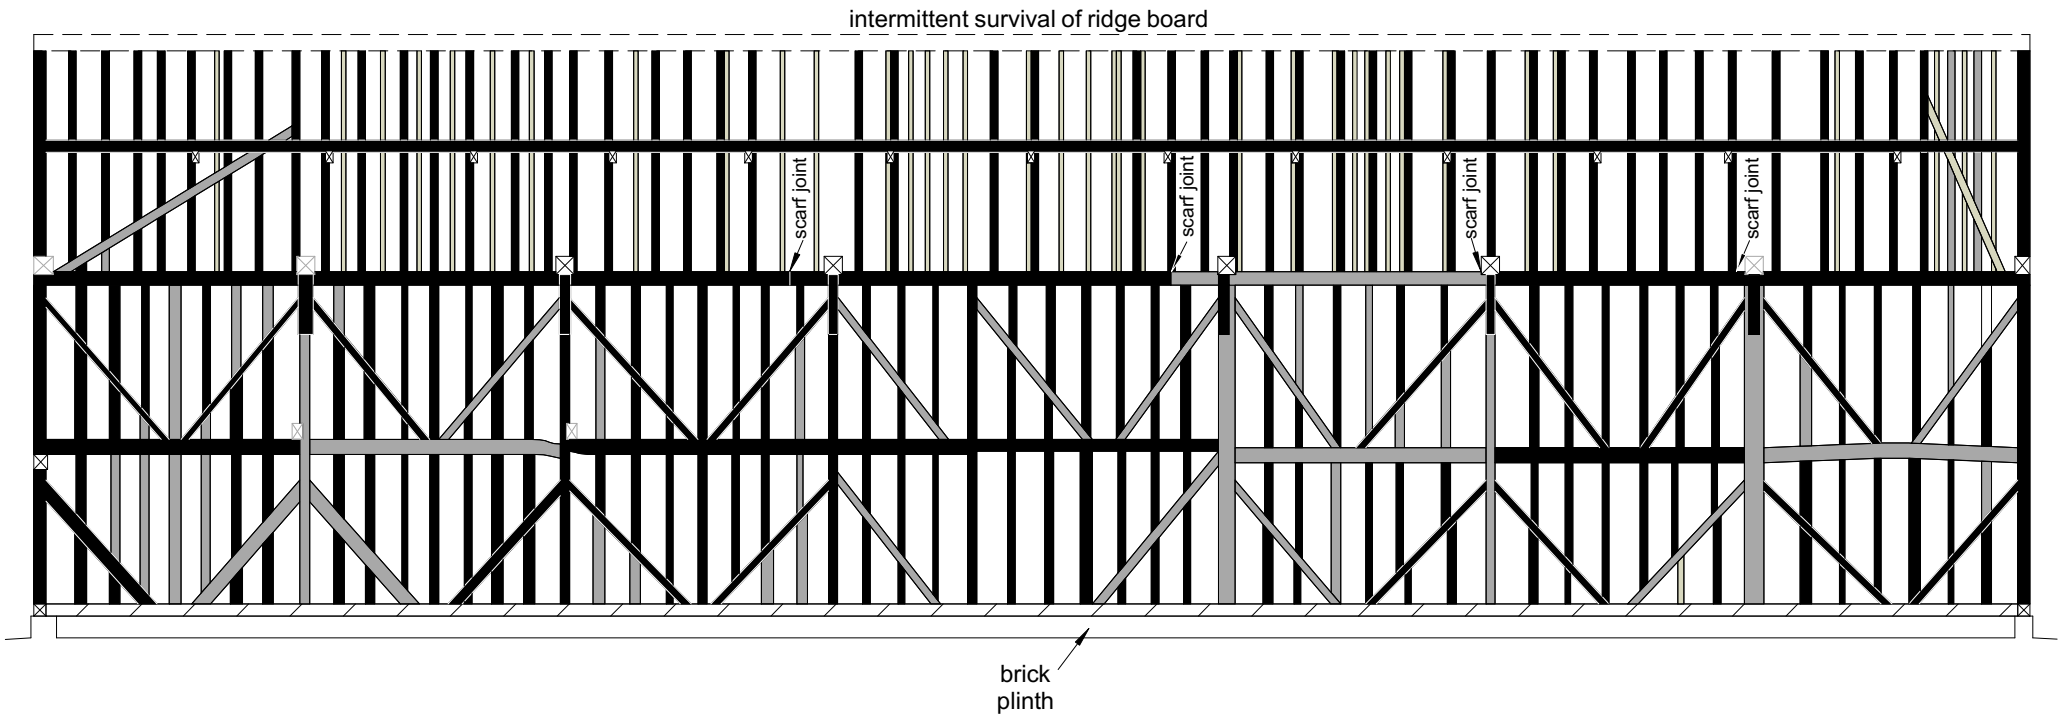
Frame drawing of the north-west wall to the Church Barn, indicating the locations of original, re-used and replacement timbers.
